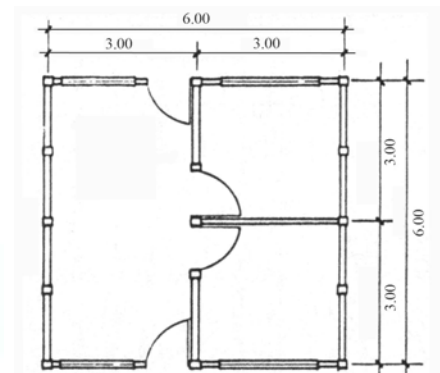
Typical plan of a minifalda building in Nicaragua with a living area of 36 m<sup>2</sup> (
